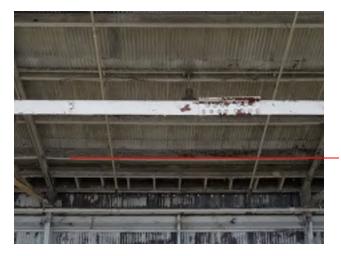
Typical wood purlin sagging (redline drawn for clarity)
